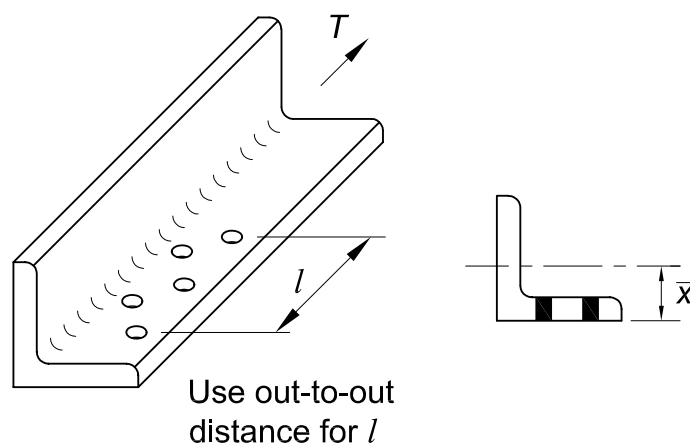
Determination of l for U of bolted connections with staggered holes.
